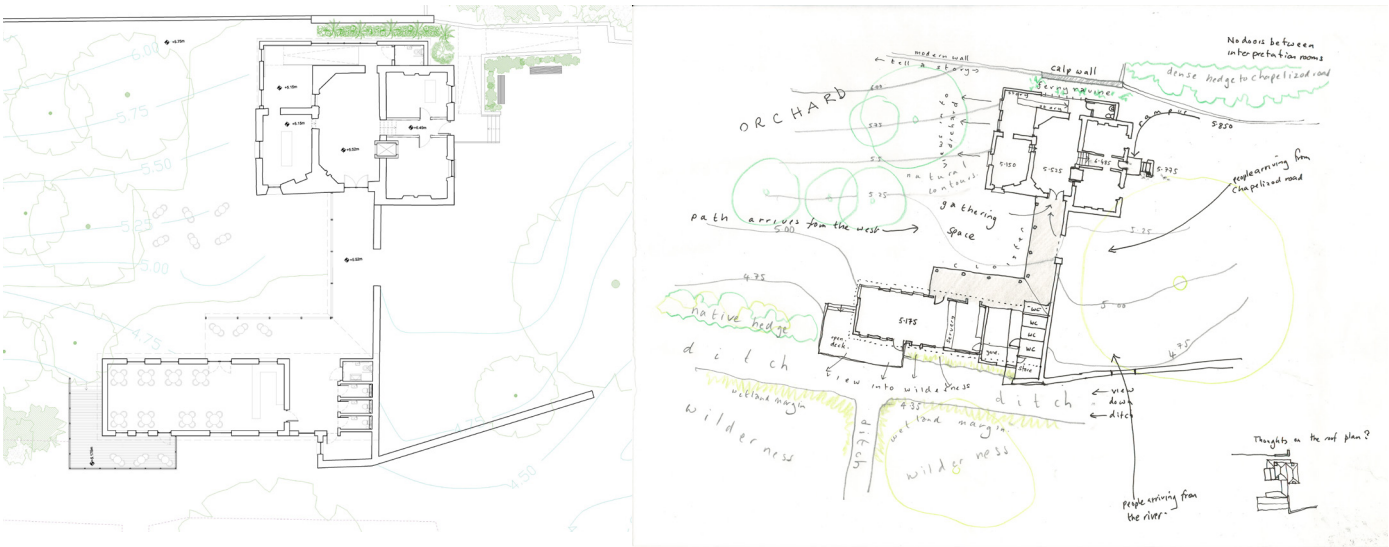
, 5.08 Plan and concept sketch of the cloister scheme
